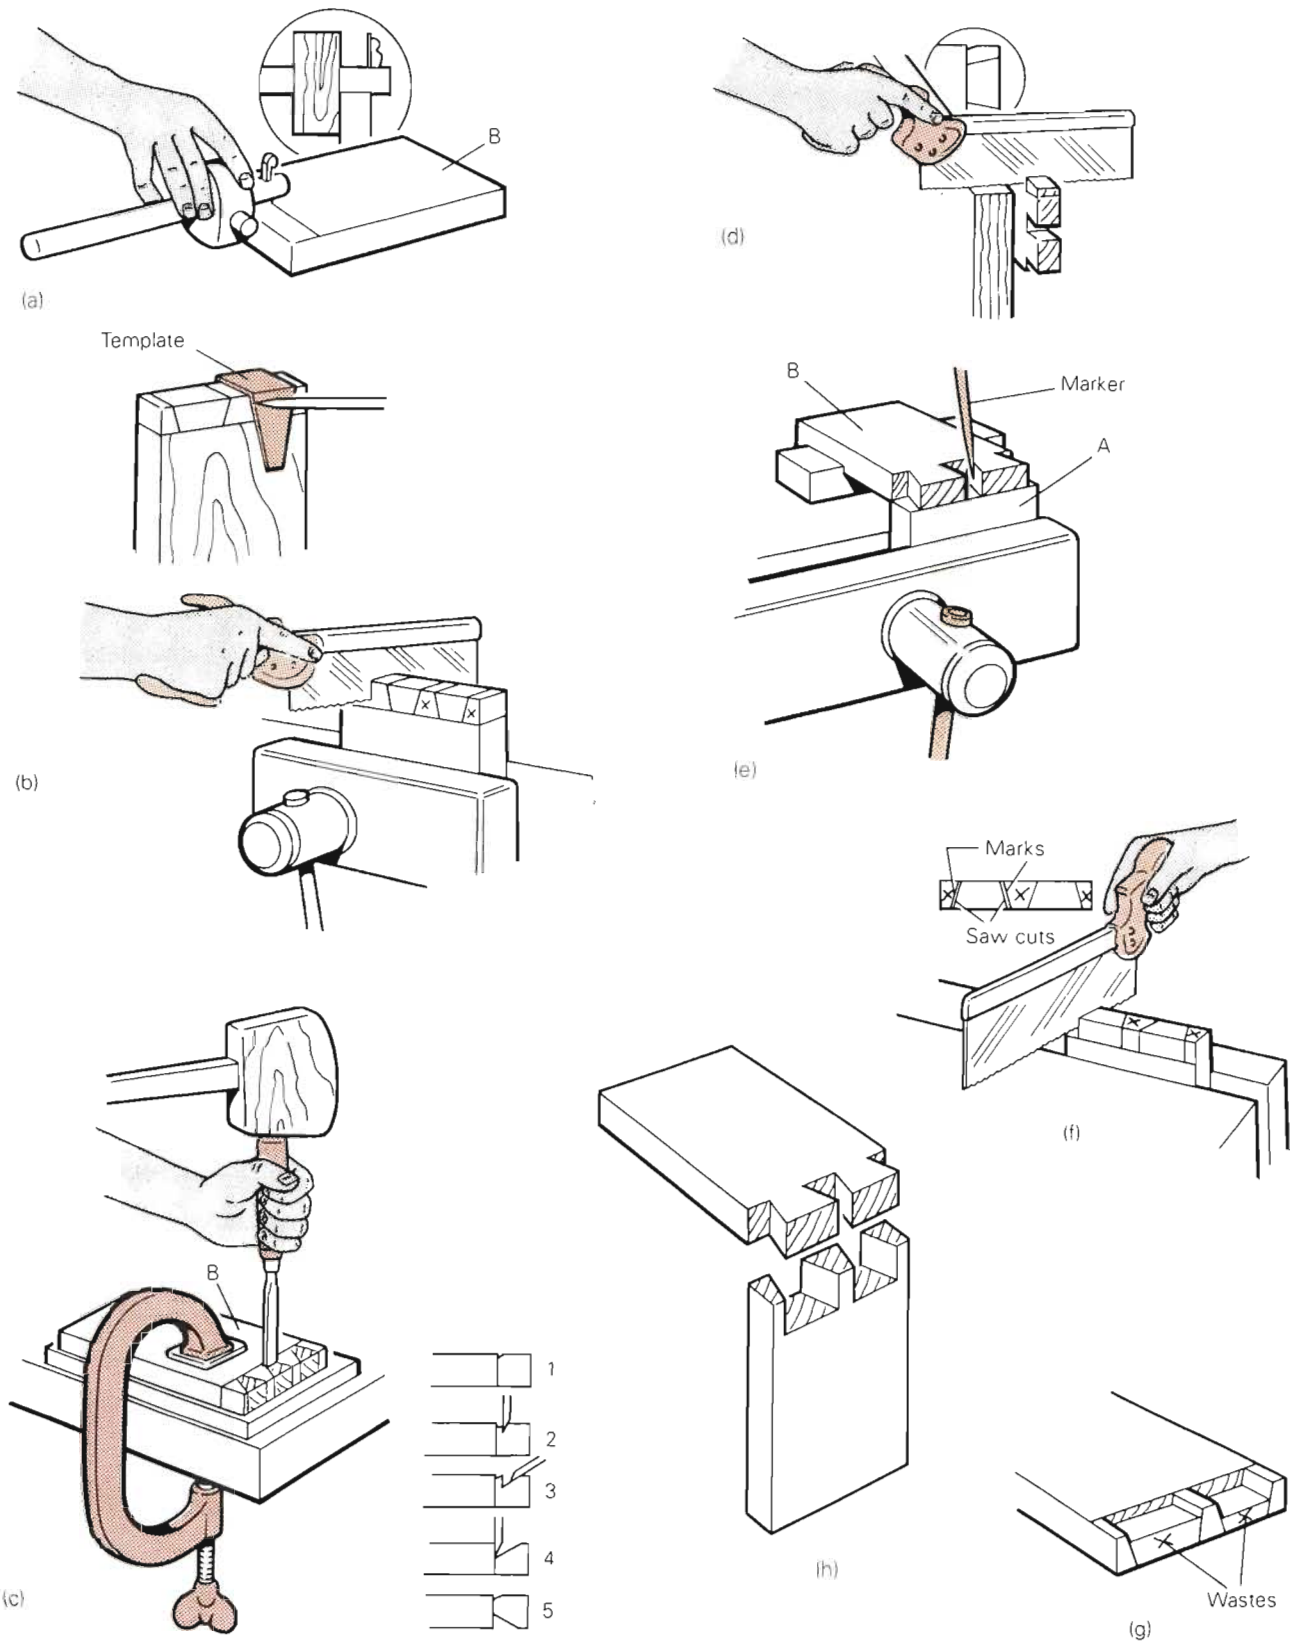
Preparing a common dovetail joint: (a) gauge the end of the piece to contain dovetails, (b) set out the dovetails, (c) chisel out waste, (d) cut off end pins, (e) Trace dovetails onto 'A', (f) saw the pins, (g) remove waste from pin sockets, (h) joint ready to assemble.
